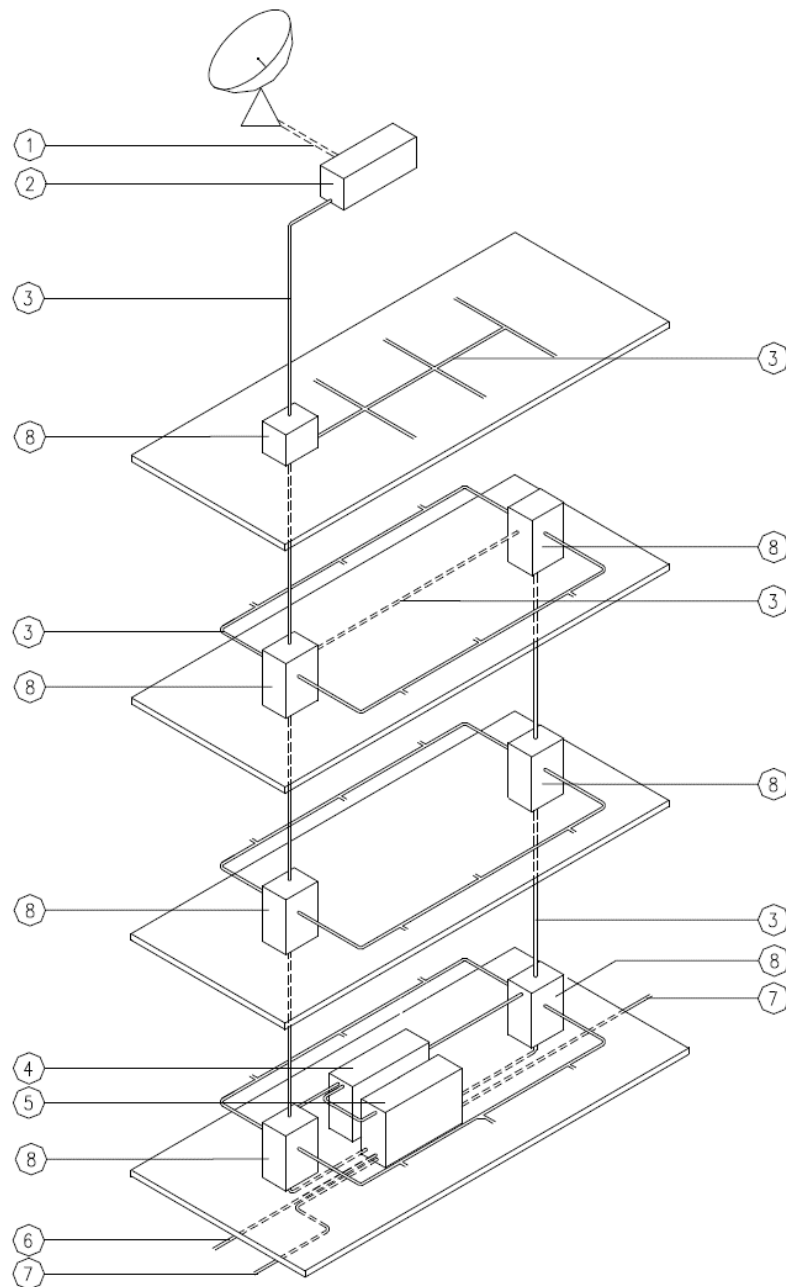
Typical Multi-tenant Building common spaces and pathways.
